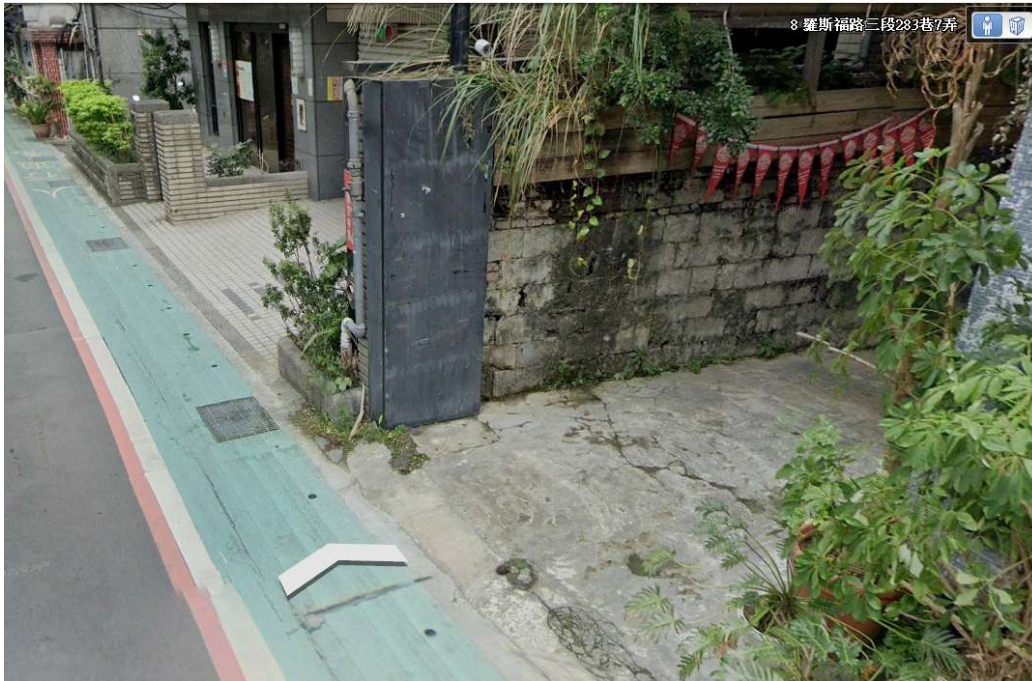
Cracking observed in the walls and floors of Building C (Google Earth, 2022).
